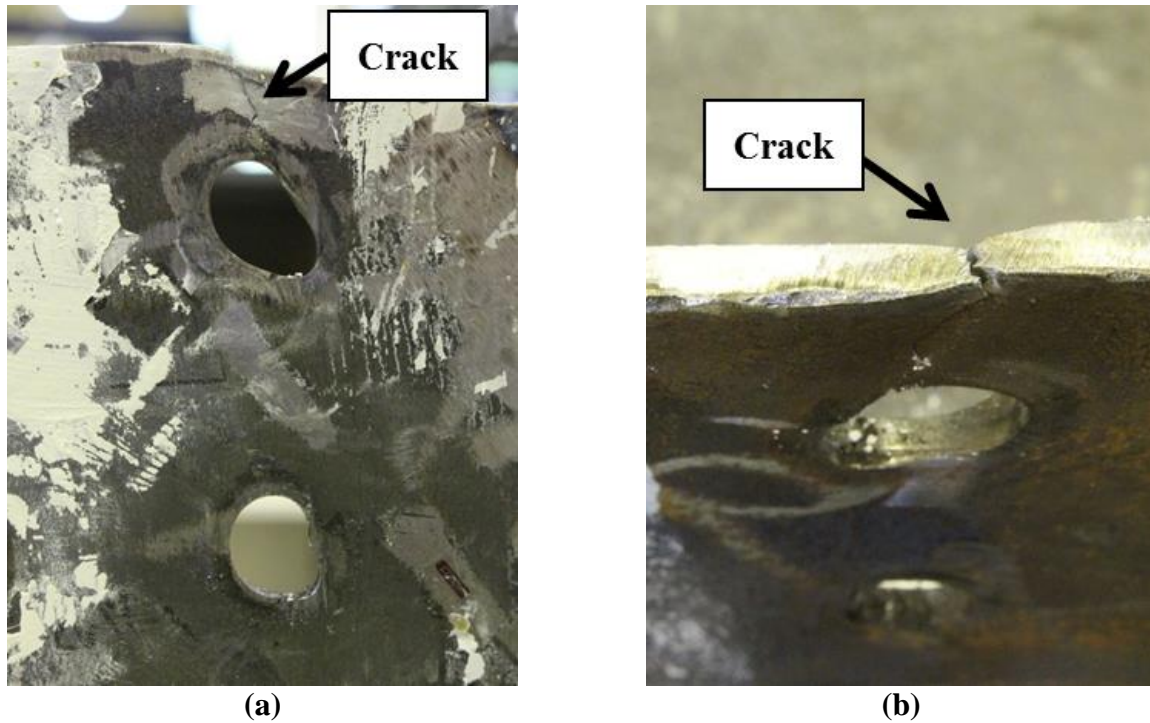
Crack at top bolt hole in beam for Specimen 1 (unreinforced) (a) side view; (b) top view
